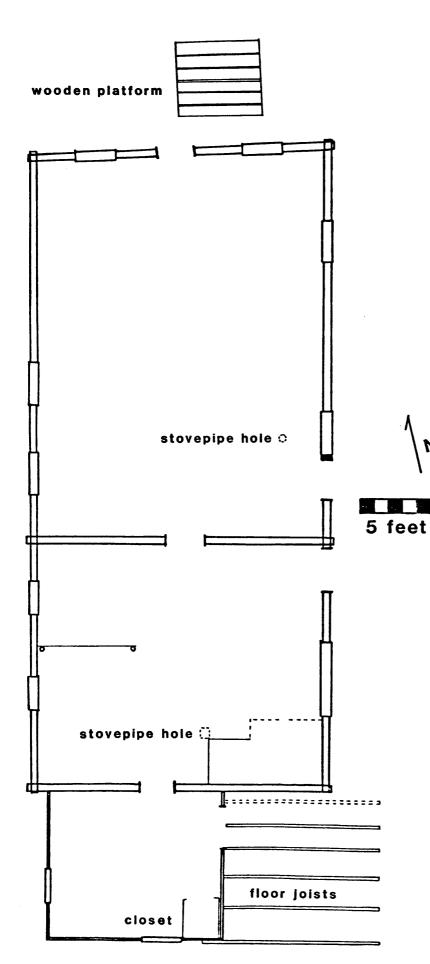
Floor plan for Feature 17, formerly Alice Mahoney's hotel and post office.
